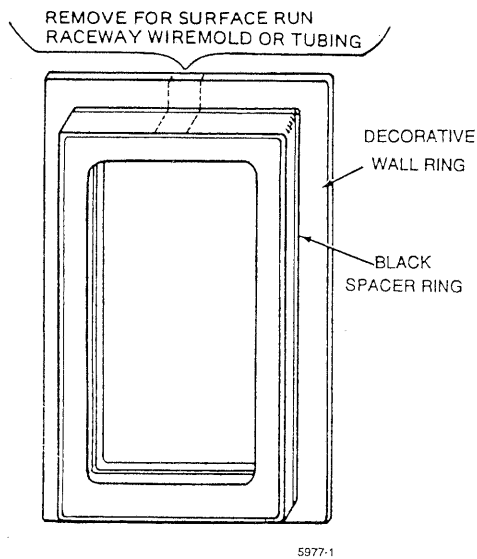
Decorative Wall Ring and Spacer Ring Modification for Surface Run Tubing.
